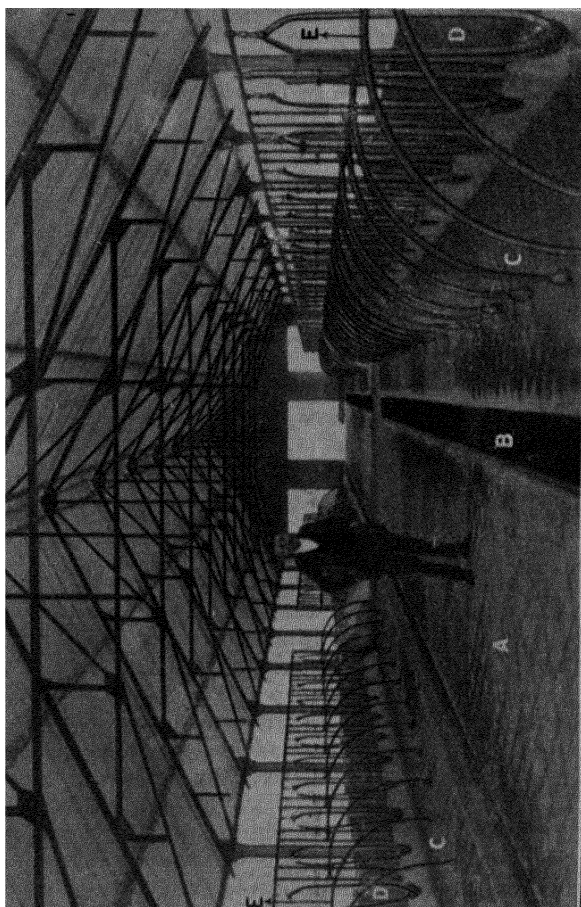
A MODEL COWSHED. A, Central Passage, 6 to 7 ft. wide; B, Manure gutter, 2 ft. wide, 10 in. deep; C, Stallings or stalls, 5 ft. to 5 ft. 6 in. deep; D, Feeding troughs of cement concrete; E, Divisions between standings made of galvanised steel tubings.
